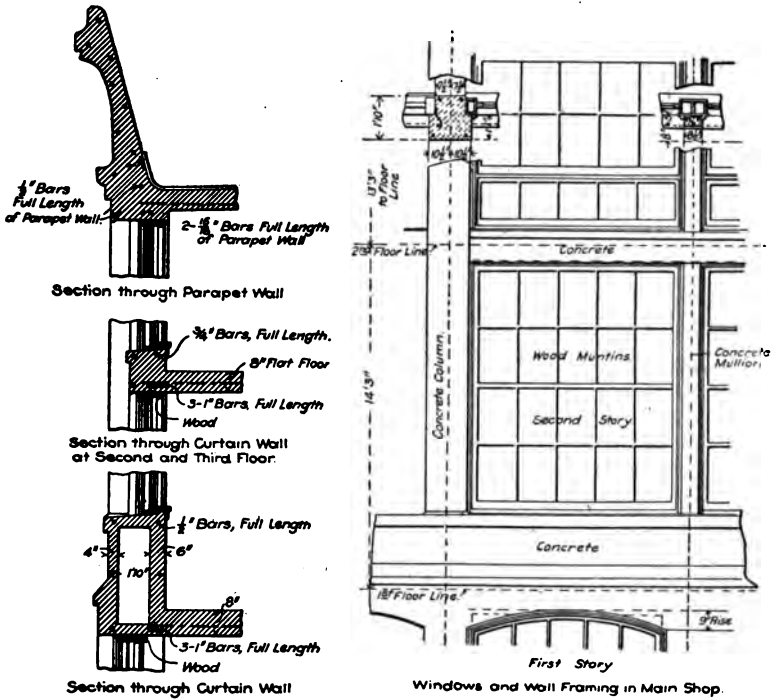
Window and Wall Framing for Main Shop, United Shoe Machinery Co.
